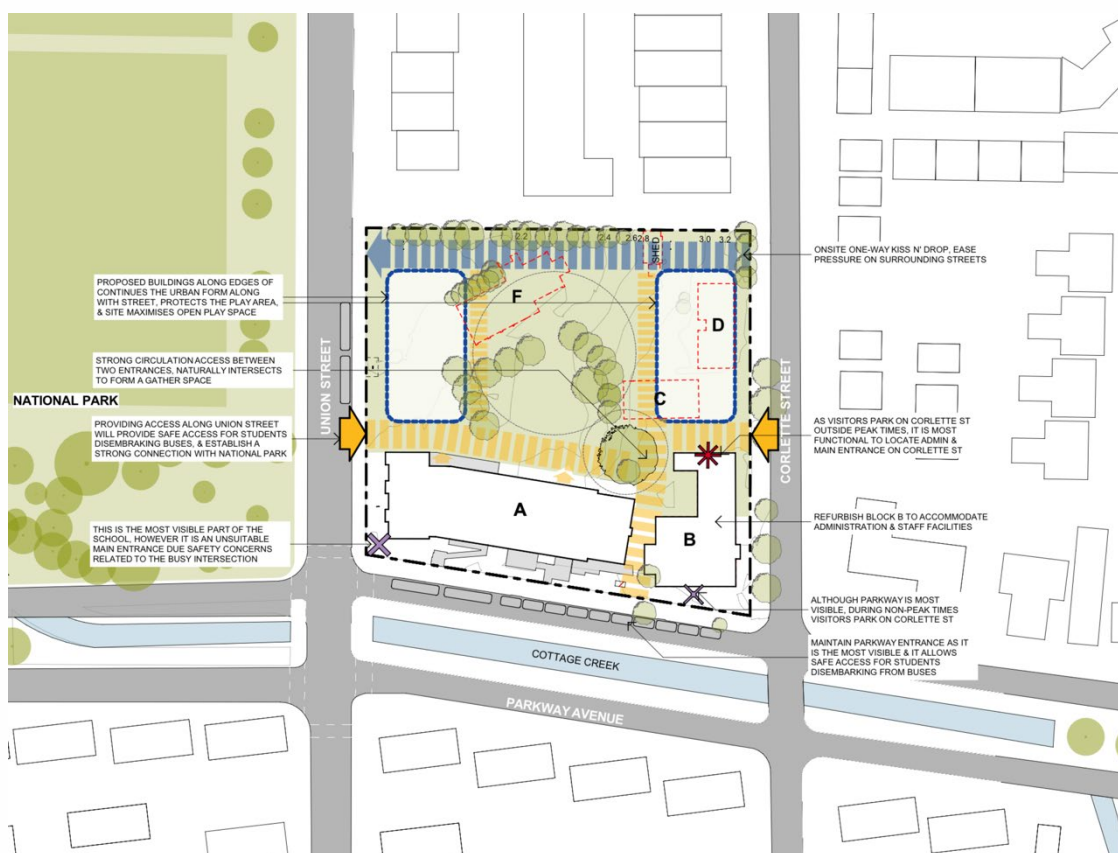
Site plan showing existing buildings in red, proposed building in blue and proposed one way 'kiss n' drop' on north-eastern boundary. Design by SHAC Pty Ltd.
